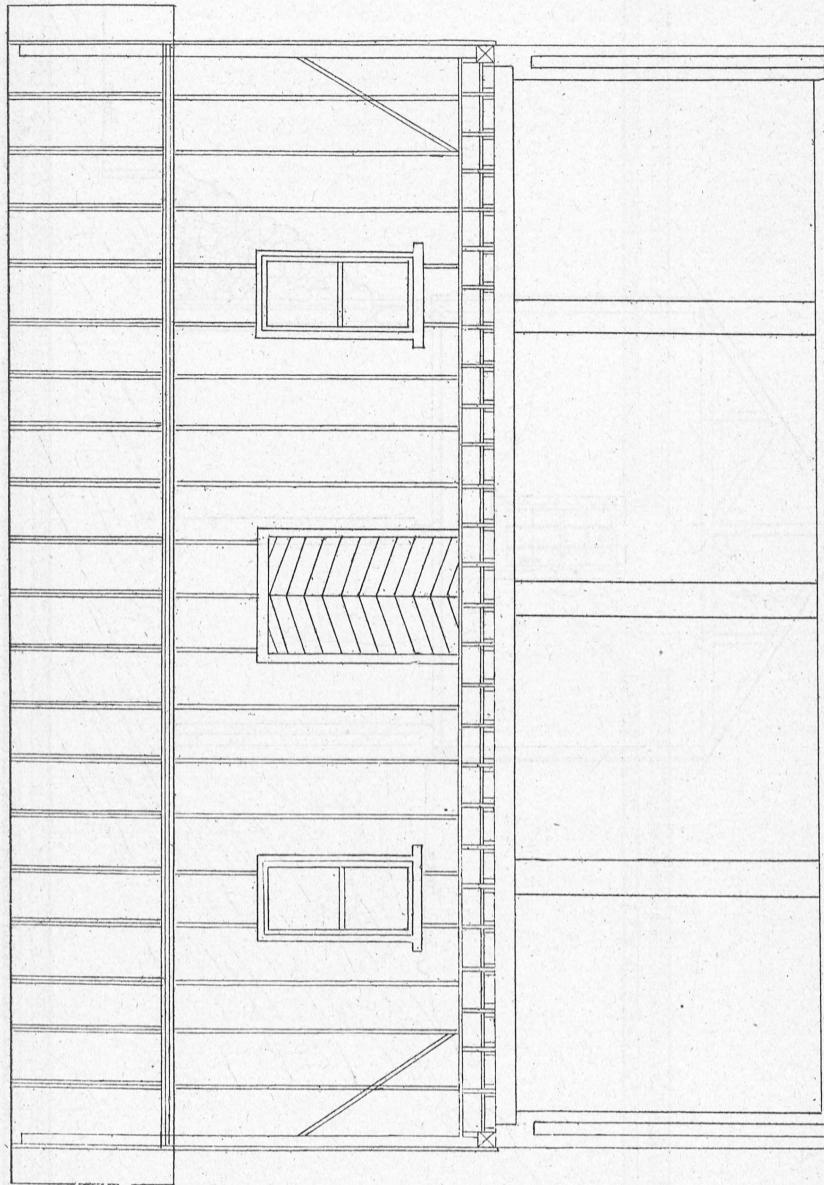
South elevation of Gold Medal Orchards' apple storage house.
